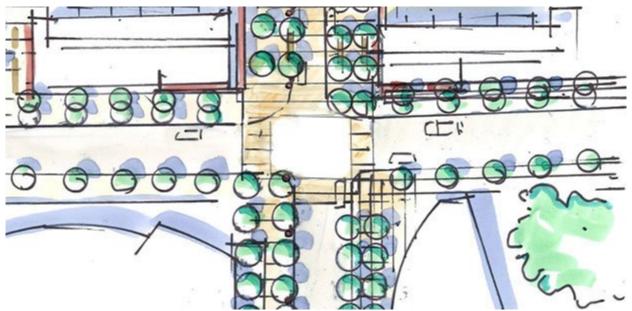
Plan View of Intersection at King Road and University Way North /Cascades Plaza
